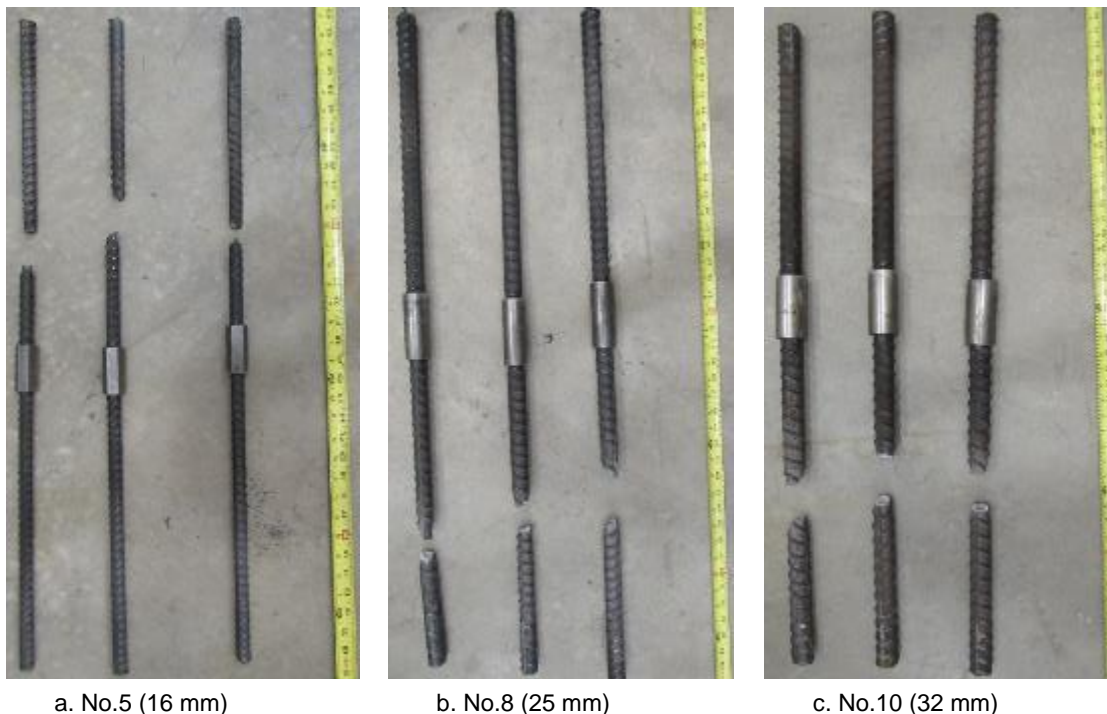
Failure of tapered threaded couplers under cyclic loading
